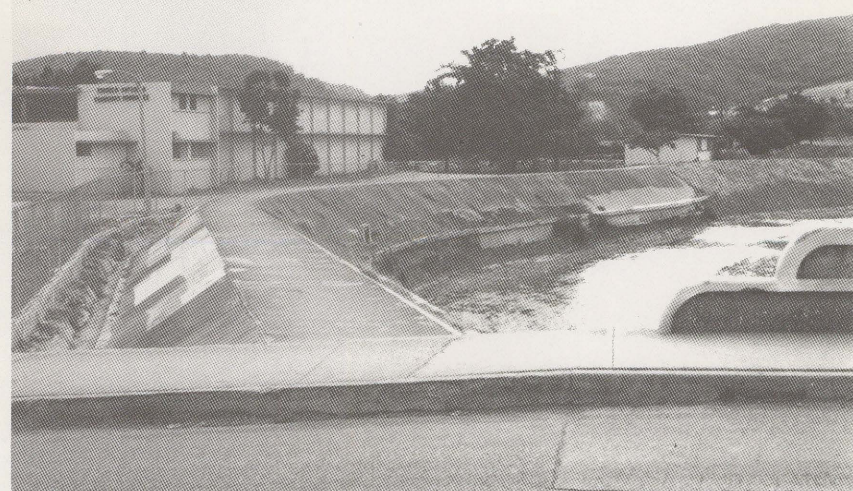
From old Highway 2 bridge (D) looking upstream (photograph I).
